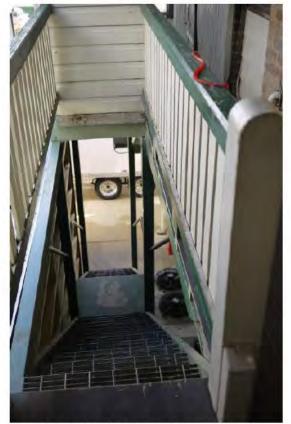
| Modern steel staircase to be removed and decking replaced over the void in the verandah.
